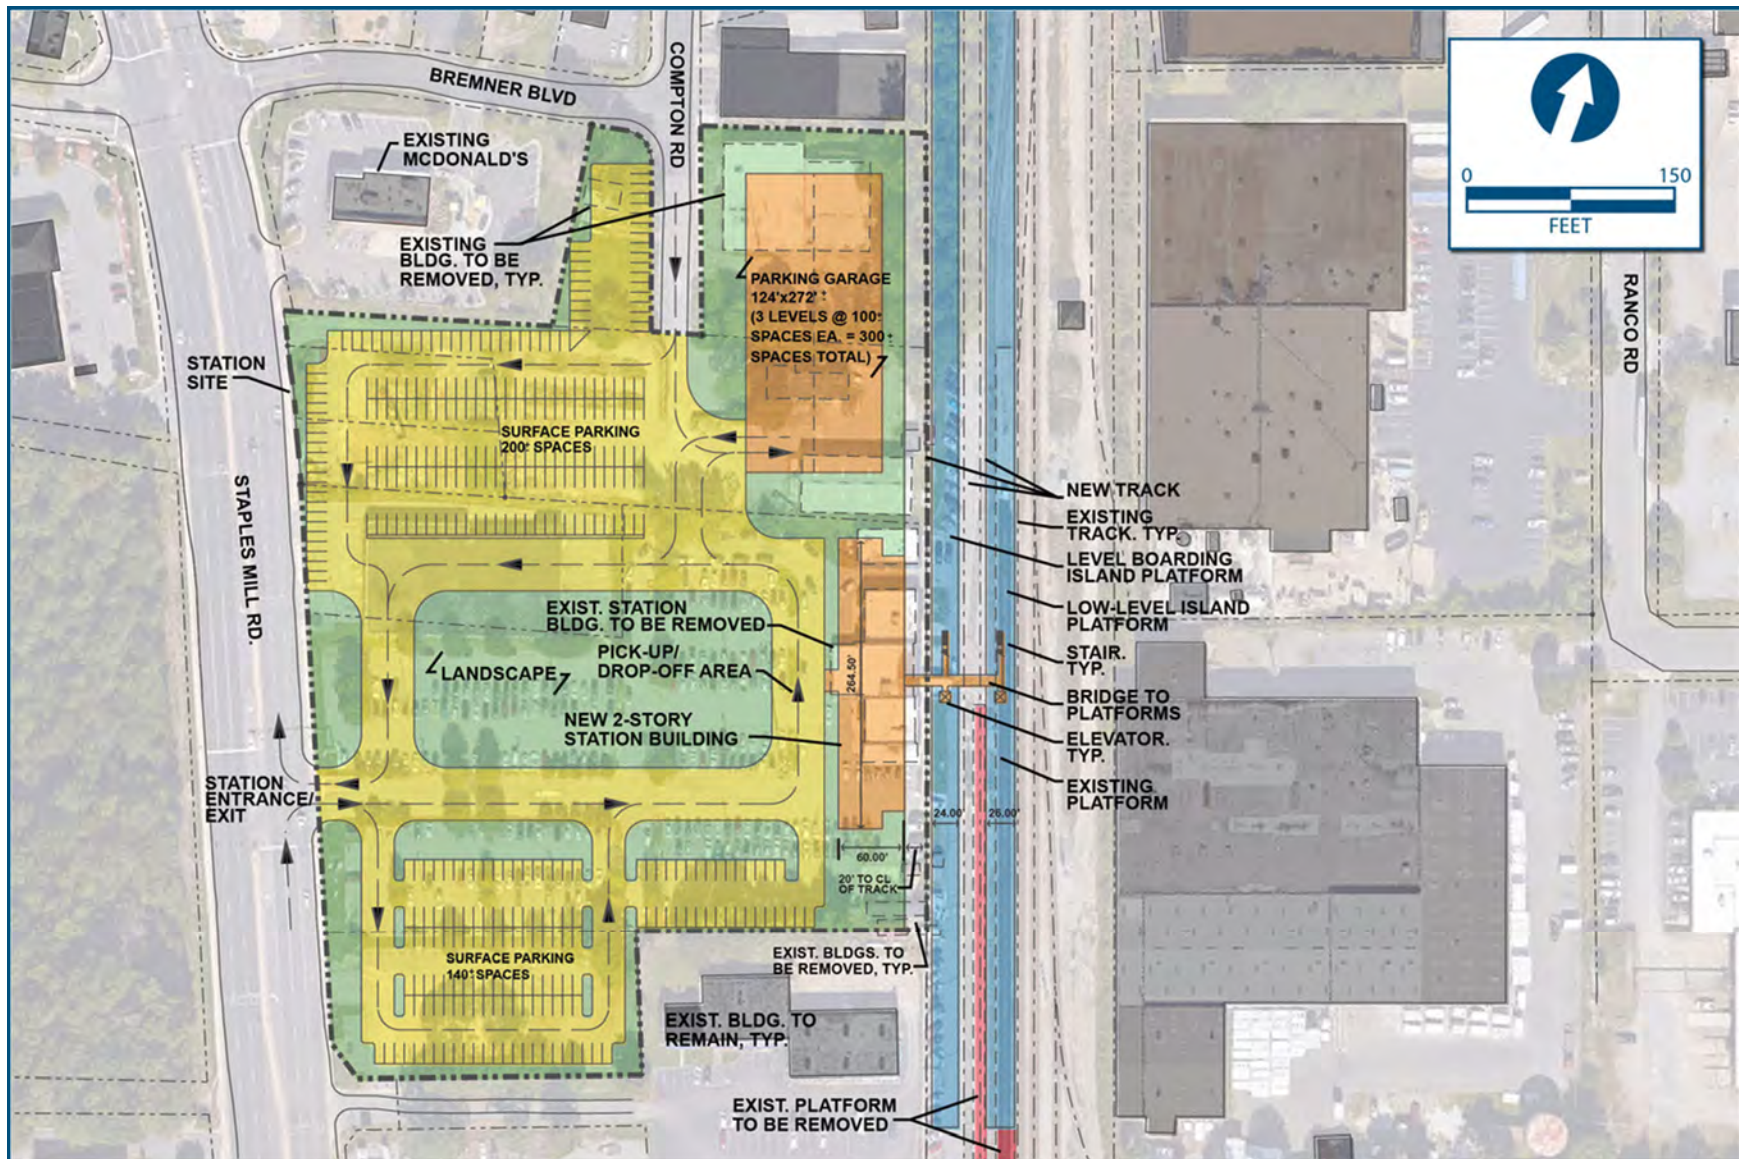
Staples Mill Road Station Improvements for Build Alternative 6A
